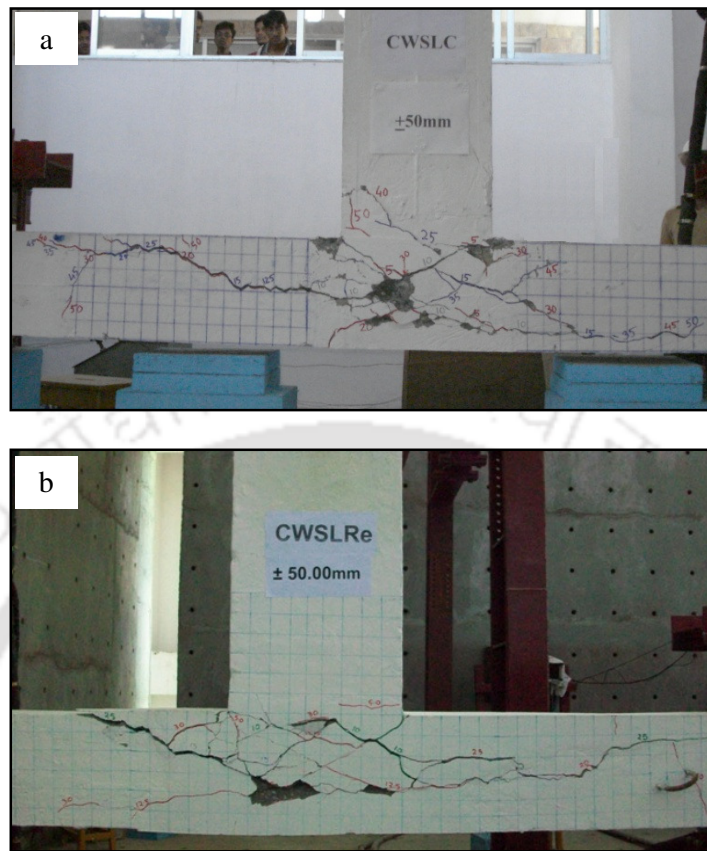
CWSL specimens at the end of test under loading type-1:
